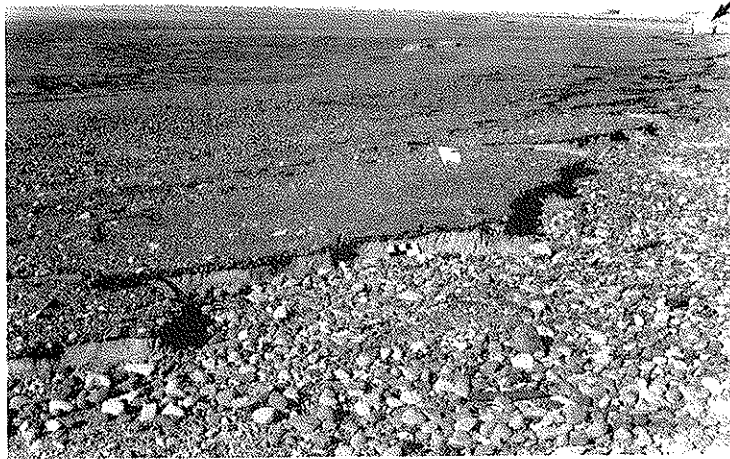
Upper Edge of Asphalt Pavement on Espora Spit Backbeach, the Edge of the Pavement and Sediment Substance has been Eroded by Backwash
